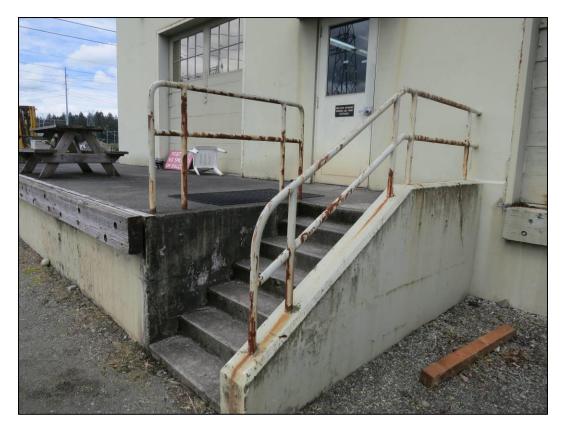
of 22. Loading dock of Untanking Tower (1942), southeast side, looking west.
